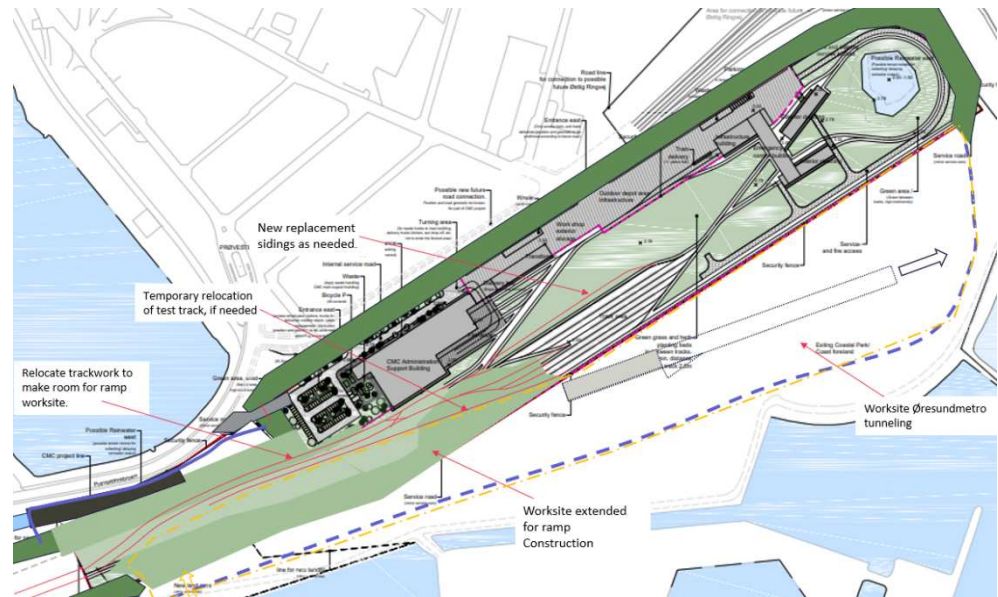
Phase 8 - Øresund metro Ramp Construction Sequence.
